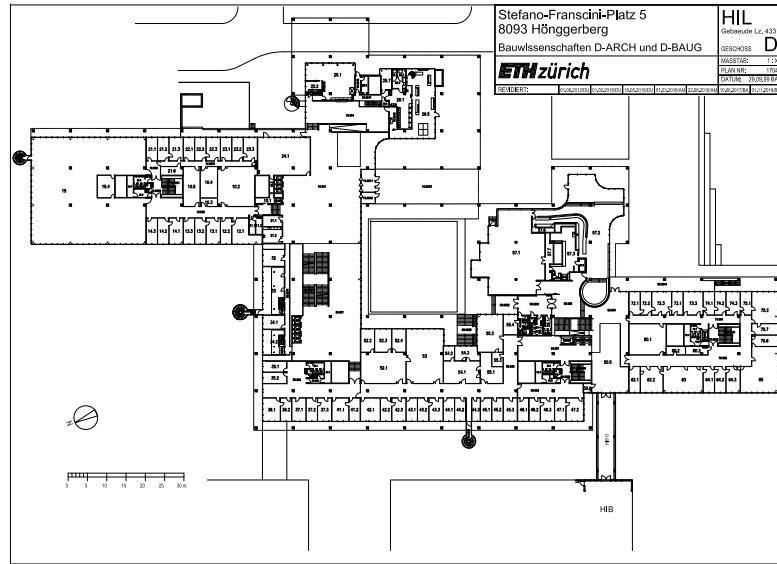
Plan of the D-floor of HIL building of ETH Zurich [5]
